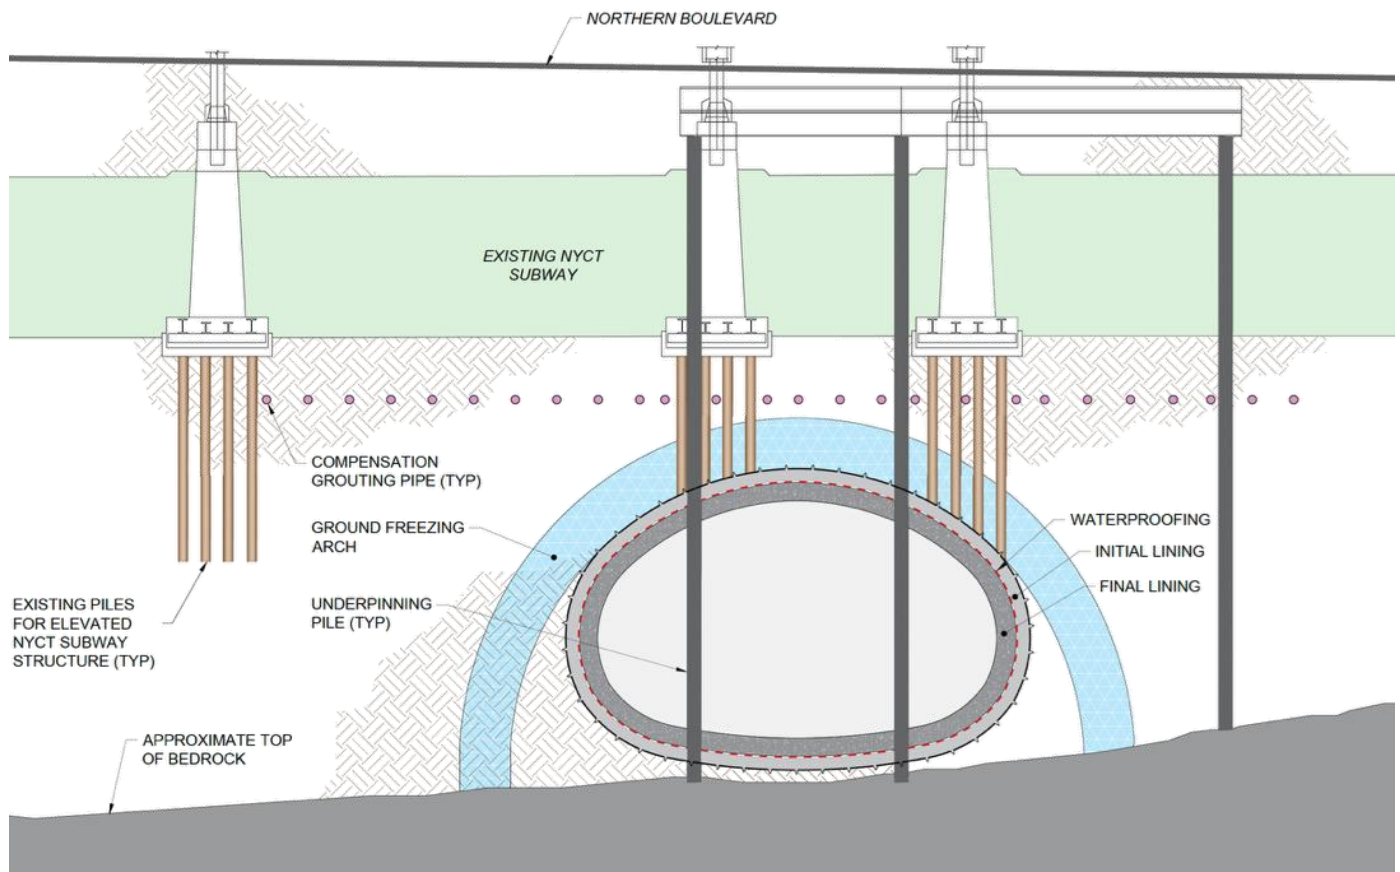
Cross section of CQ039 showing existing structures and the process of protecting and underpinning them, including compensation grouting, the extent of frozen ground, and the underpinning temporary support piles for the elevated subway structure.
